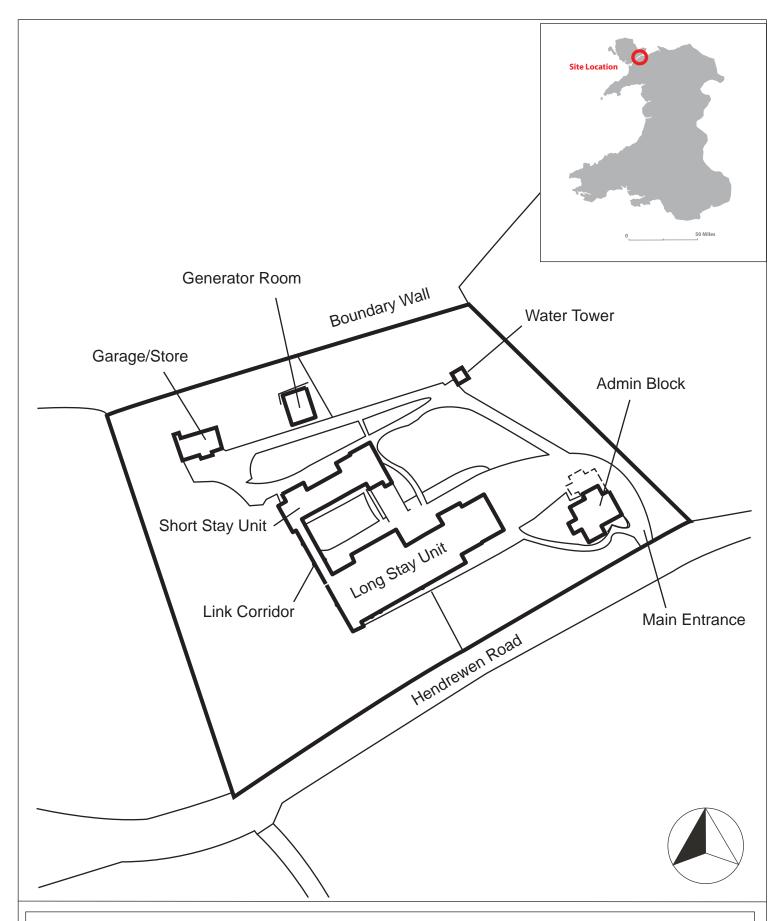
Location of Minffordd Hospital Complex based on Client Drawing R5013_90_Existing Site Plan. The complex is surrounded by a stone built wall and is accessed via Hendrewen Road. Pasture fields are located in all directions.
